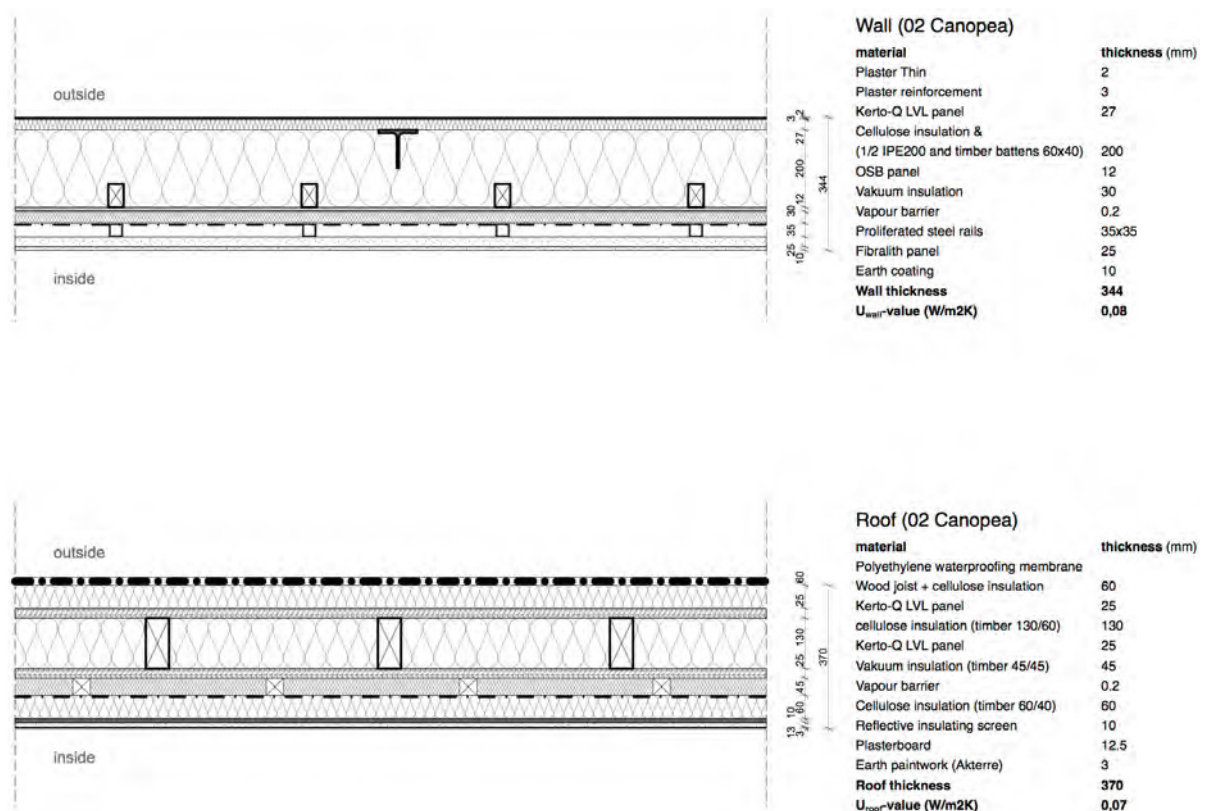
Composition of 02 Canopea wall (upper figure) and 02 Canopea roof (lower figure) external layer.
